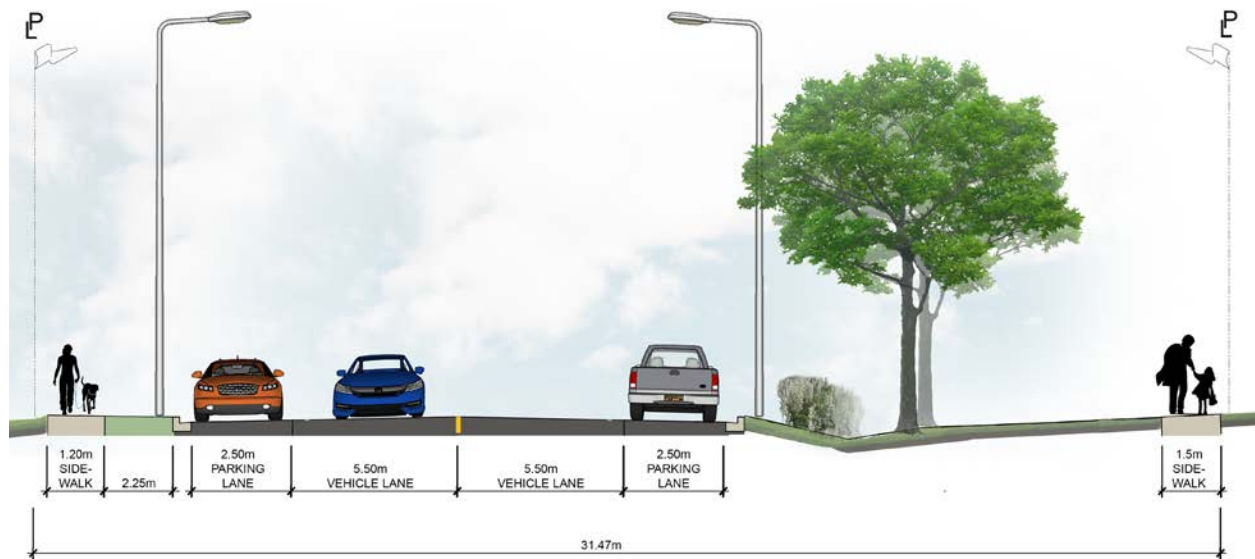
THE WEST END SECTION - EXISTING CONDITION
